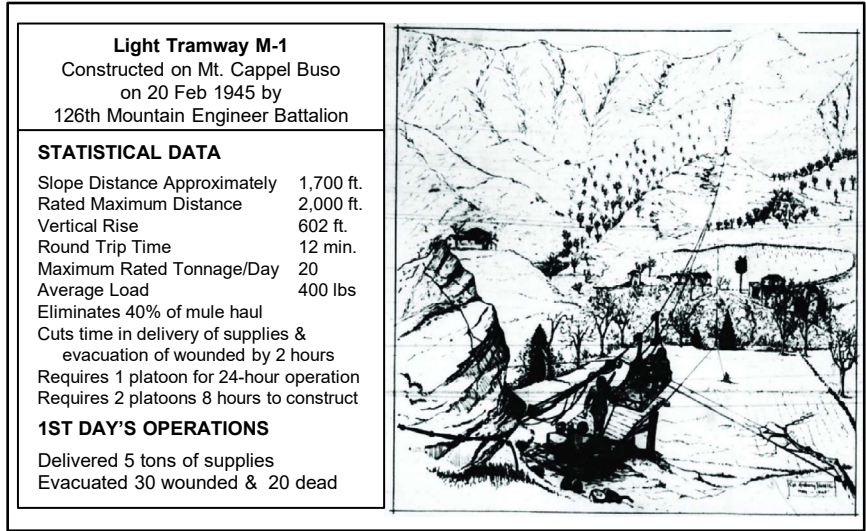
Engineer Tramway Constructed at Riva Ridge.
